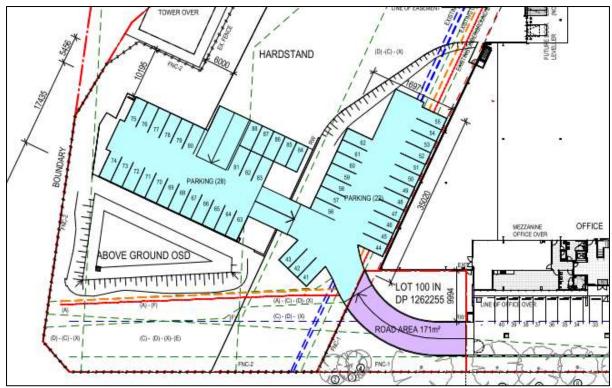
Extract of the site plan showing the parking area within the approved landscaped area.
